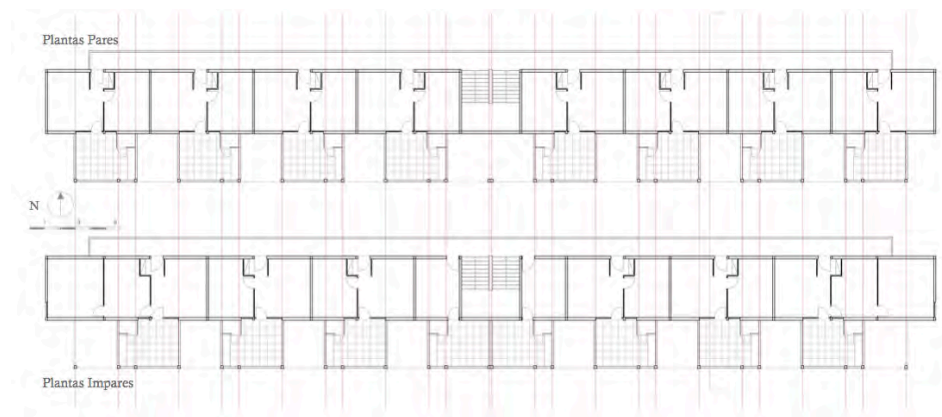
'Nid d'Abeille': Second floor (above) and third floor (below)
